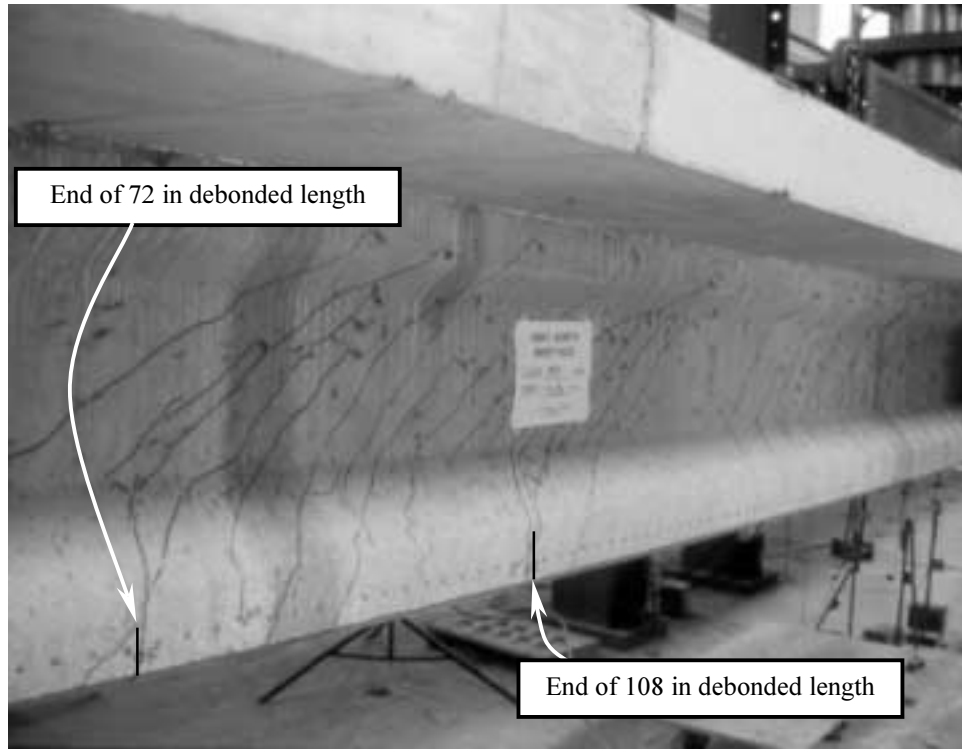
Test H9R-C-96H—Cracks at Final Load (Flexural Failure with Strand Slip)
